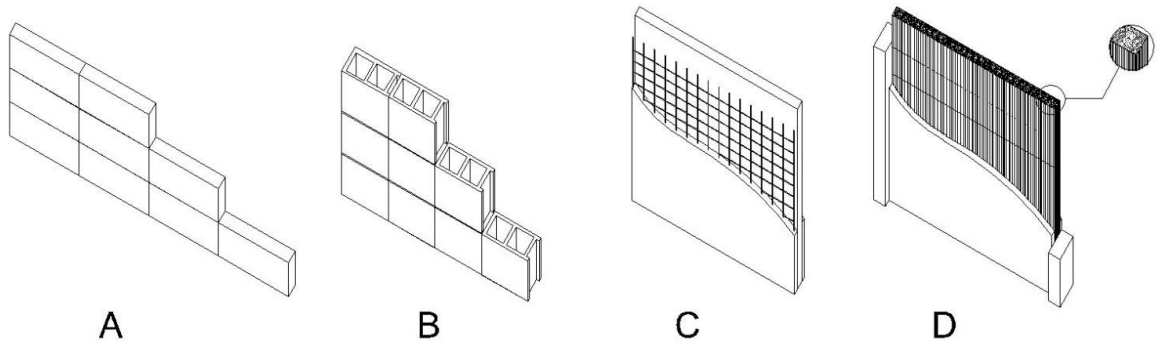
View of the four wall technologies; (a) autoclaved aerated concrete block (AAC Block), (b) concrete masonry unit (CMU), (c), 3D sandwich panel wall and (d) pressed reeds panel
